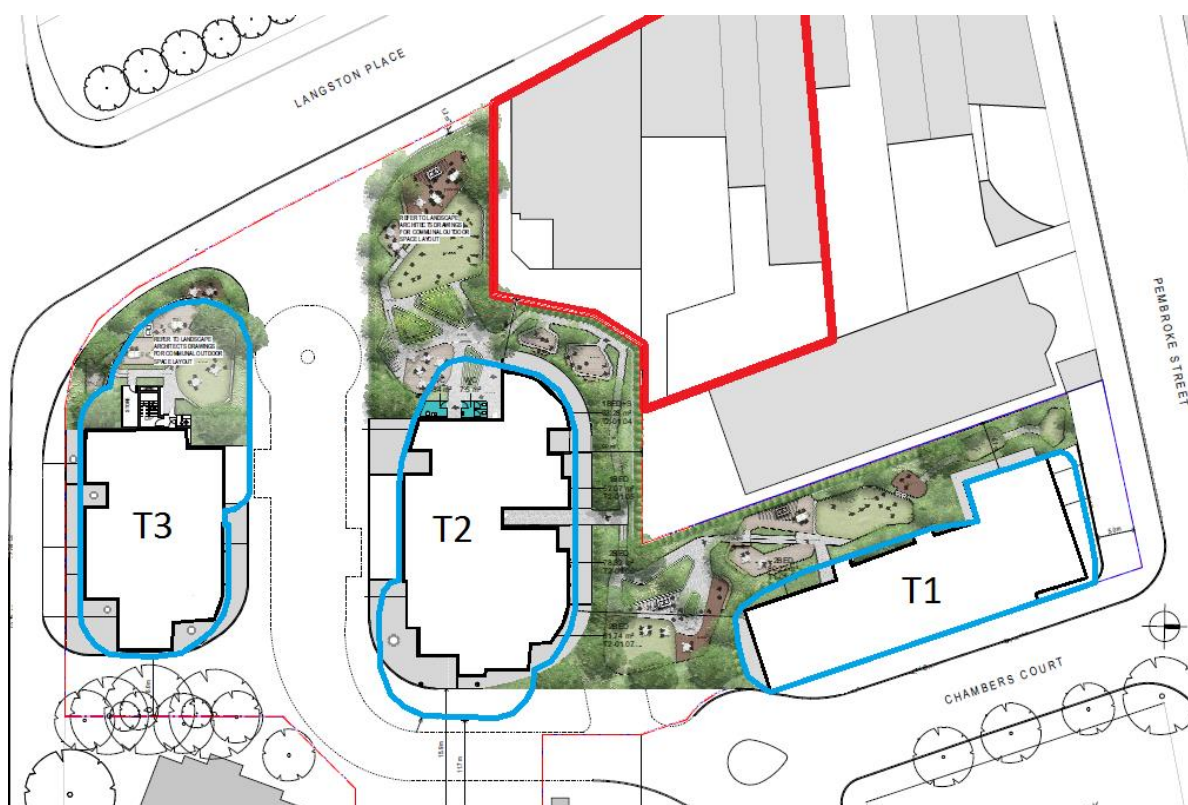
First floor communal open space areas (green) on approved development at 12-22 Langston Place (subject site in red, tower footprints above open space in blue).
